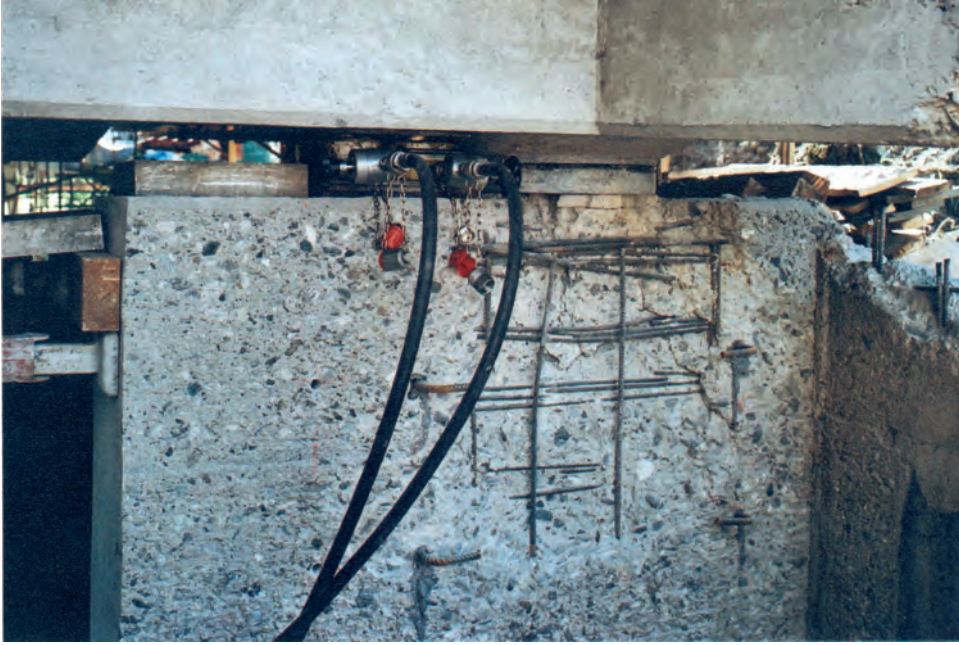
Enlarging and reinforcement of the abutment walls [1]
